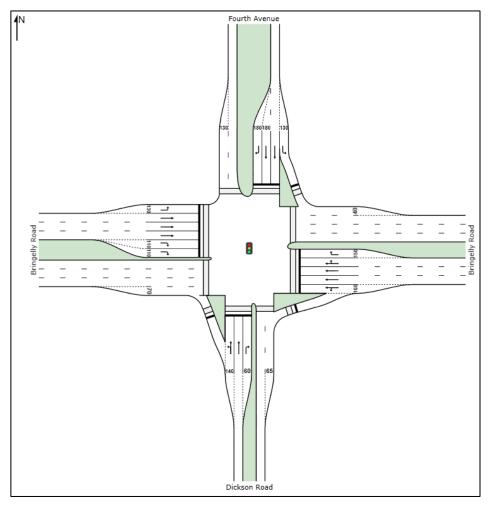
Future Layout of Bringelly Road with Fourth Avenue and Dickson Road (SIDRA)
